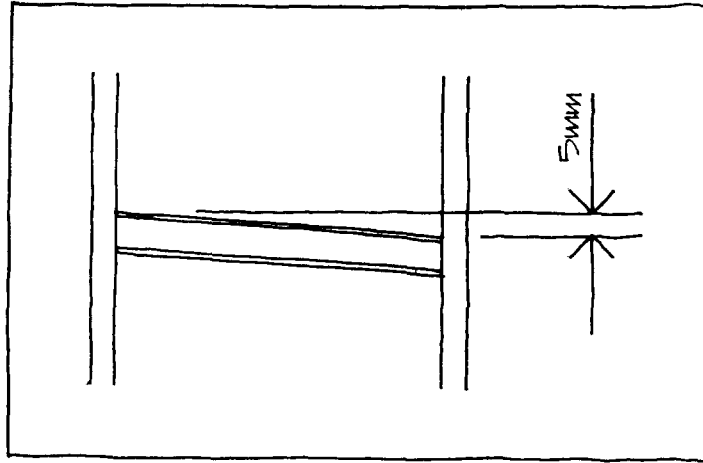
Individual beams should not be out of level by more than 5 mm (NSSS Clause 9.5.8)
